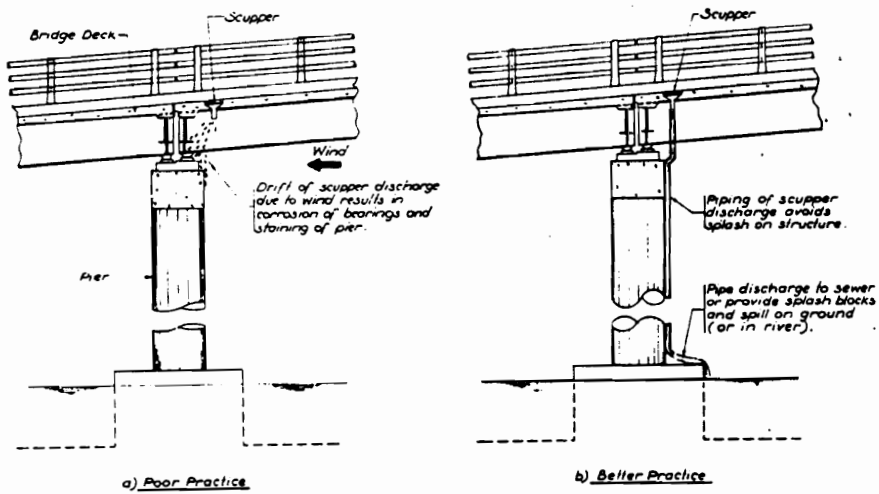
Poorly detailed drips and scuppers. "These should be provided with downspouts located so that the discharge cannot be blown against the lower construction" (Johnson, 1965, pp. 90-92).
